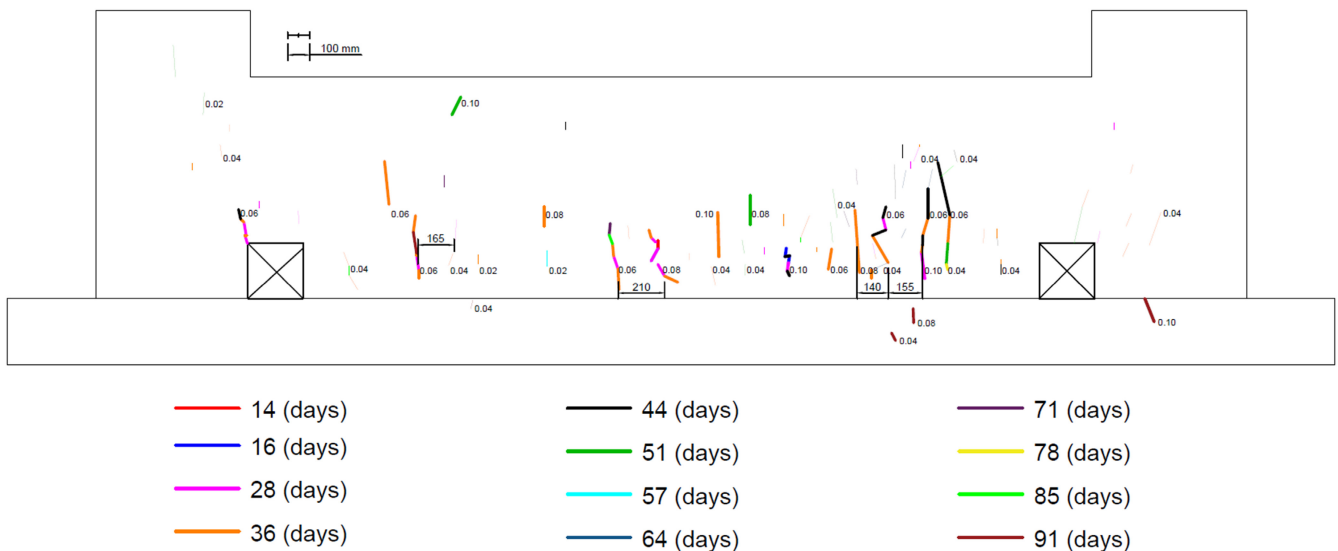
Crack layout and width for wall ICL-2. ICL, Imperial College London
